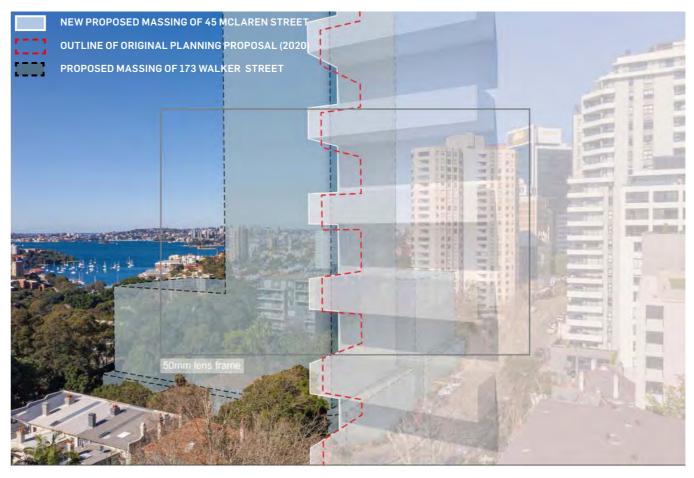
PHOTOMONTAGE INDICATING PROPOSED INDICATIVE BUILDINGS
